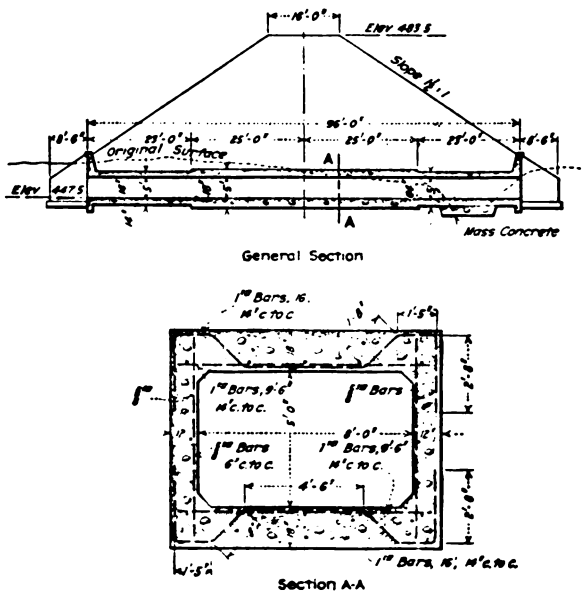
Details of box culvert on lines of Eastern-Texas Traction Co.
